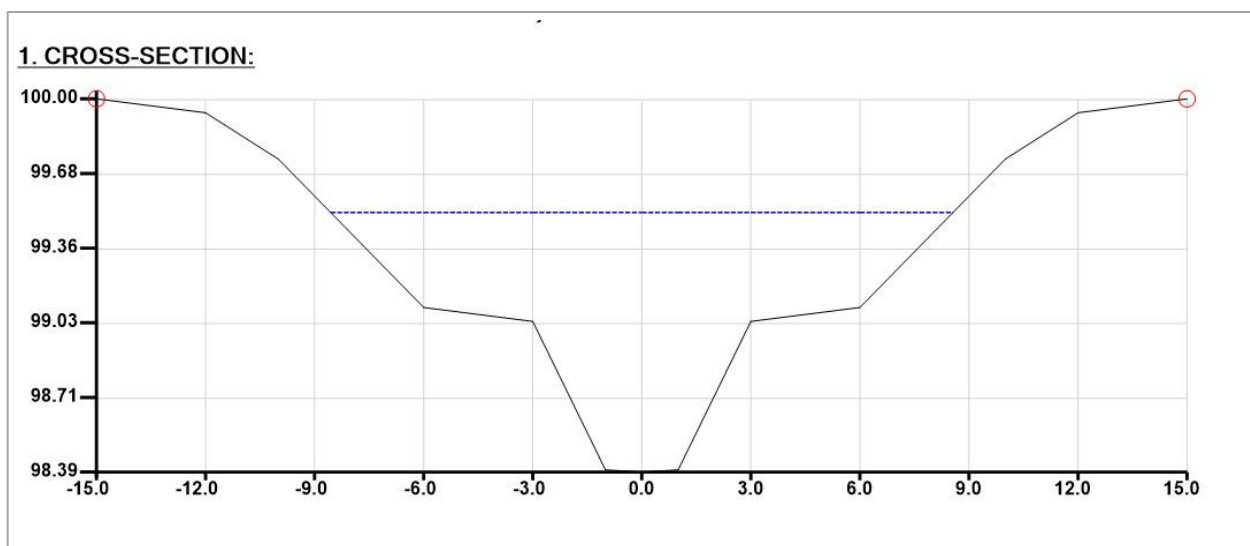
Typical Road Cross-Section showing the 100 year ARI Flood Level
